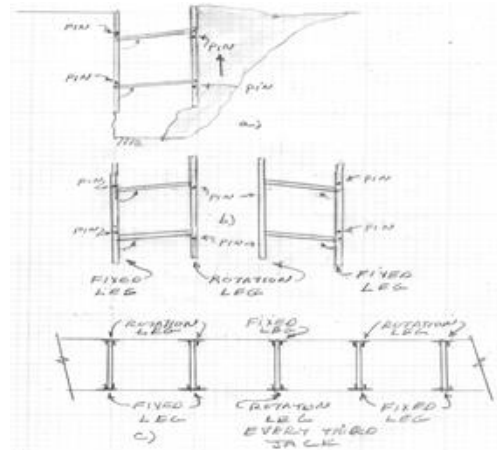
a) Trench jack fold up failure, b) leg rotation, c) jack rotation to prevent fold up
